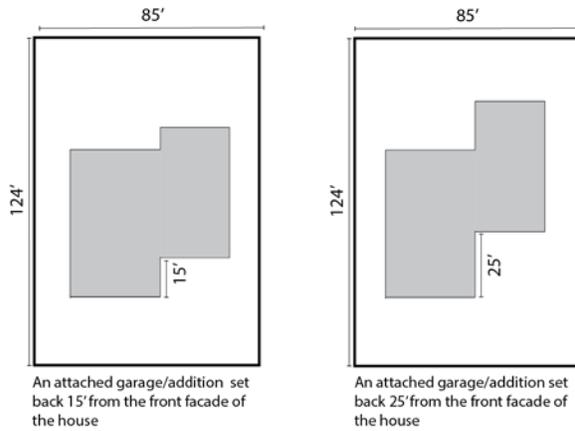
An example of a 1,300-square-foot attached garage/addition set back either 15' or 25' from the front façade of a 1,900-square-foot house
